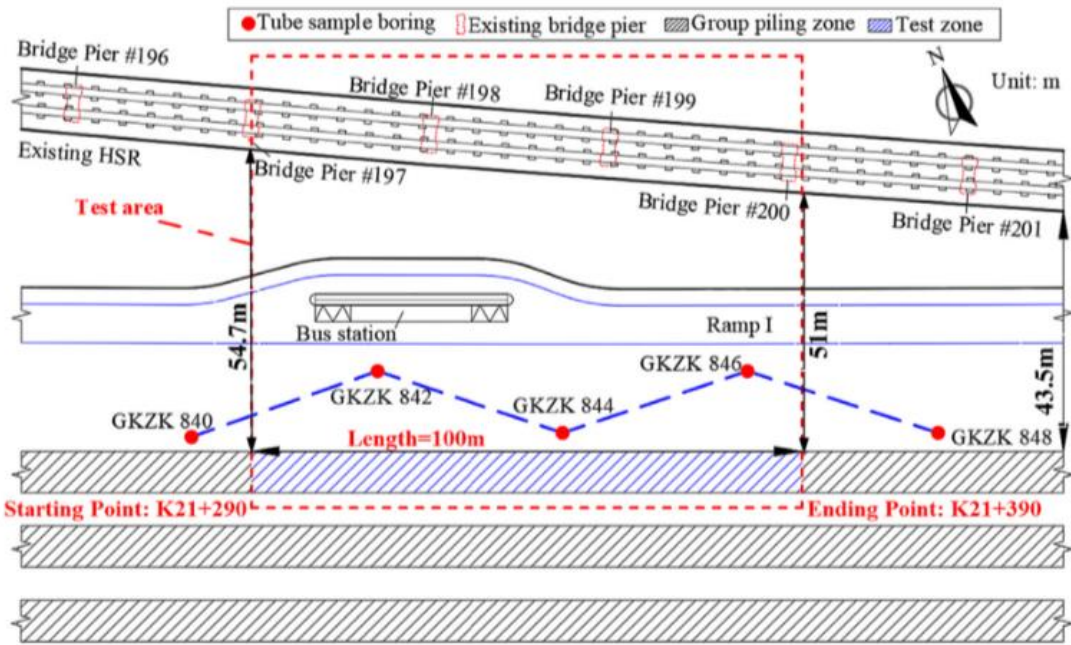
Plan view of the new constructed highway and the existing high-speed railway bridge.
